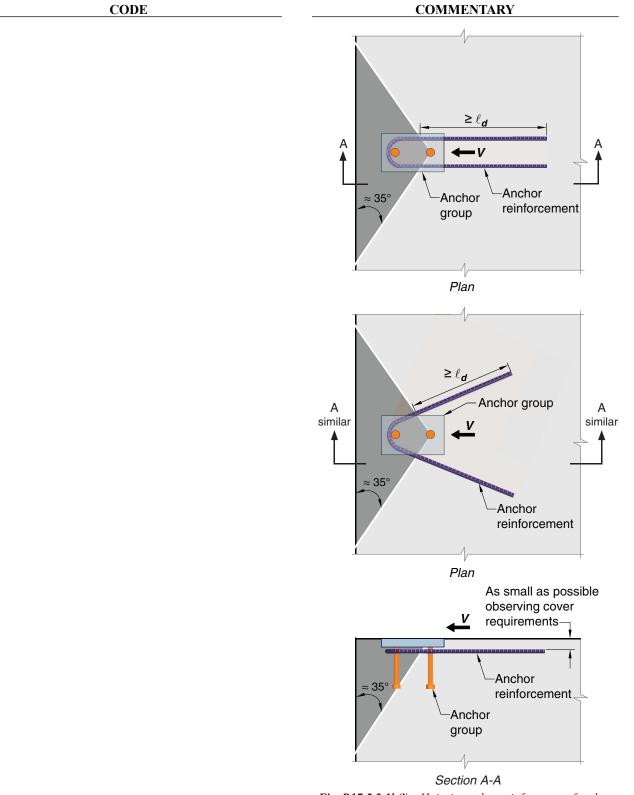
(i)—Hairpin anchor reinforcement for shear.
